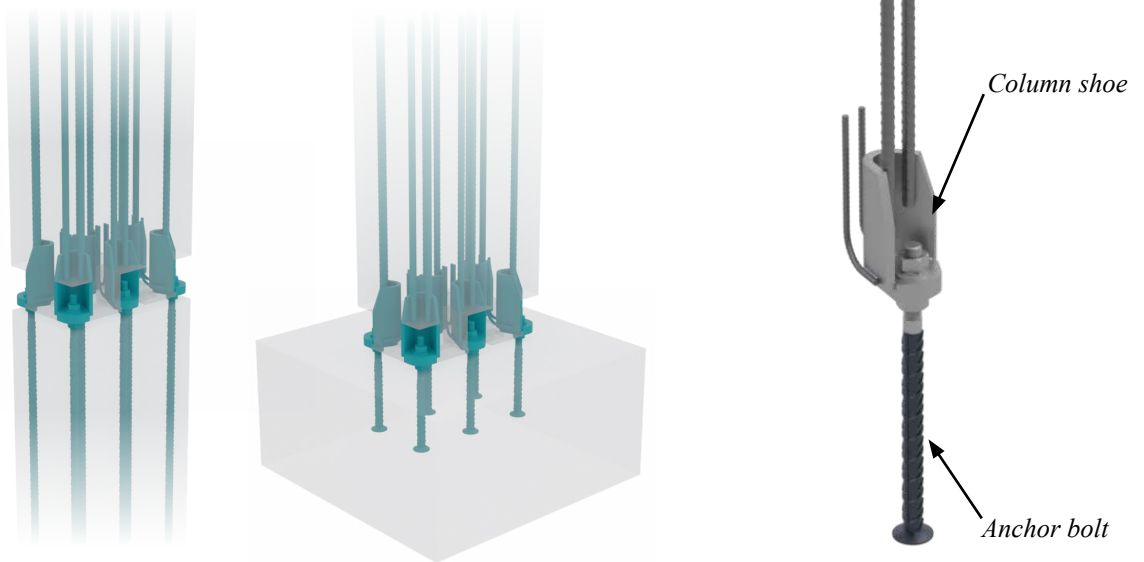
HELKA® Column Shoes and HPM® Rebar Anchor Bolts in column connection.
